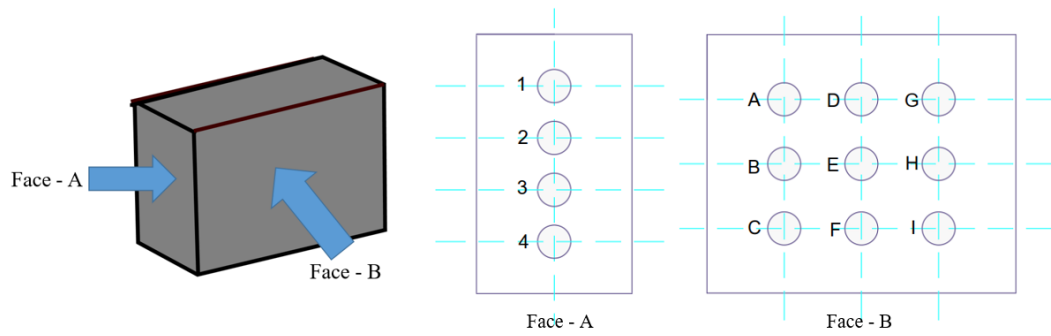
Sketches showing faces where UPV tests were carried out
